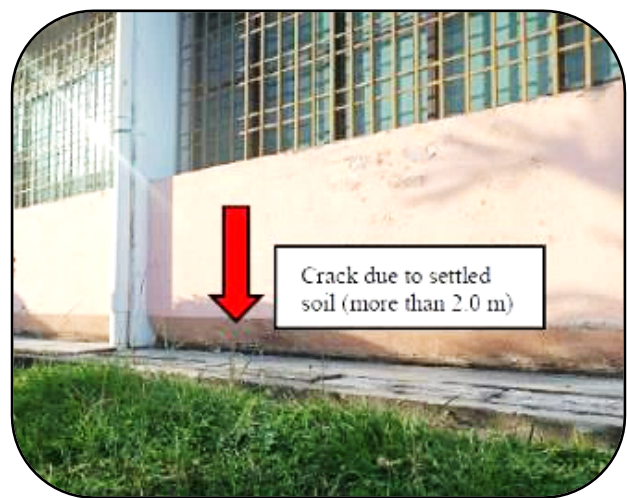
Visible cracks at wall due to soil settlement
